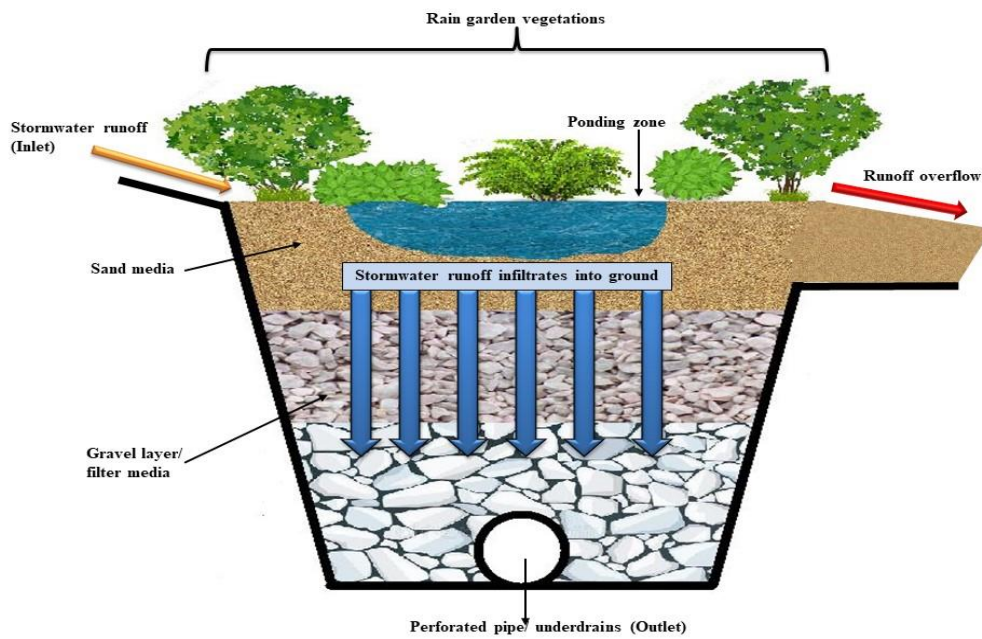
Cross sectional of a typical raingarden for stormwater runoff treatment
